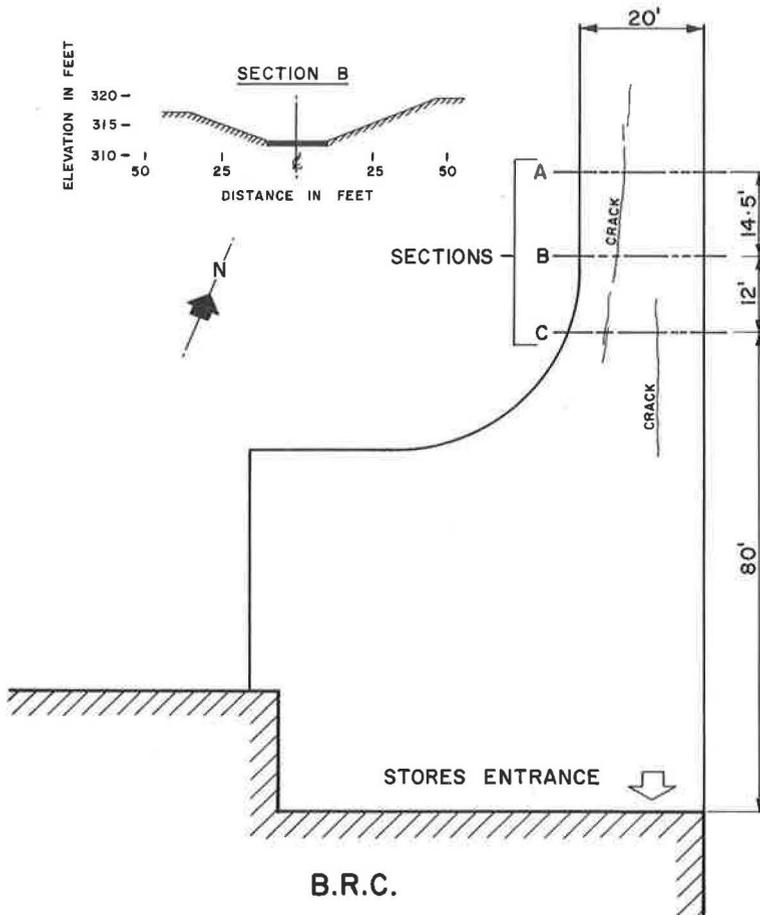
Plan of rear of Building Research Centre showing position of cracks in road-way and sections studied.
